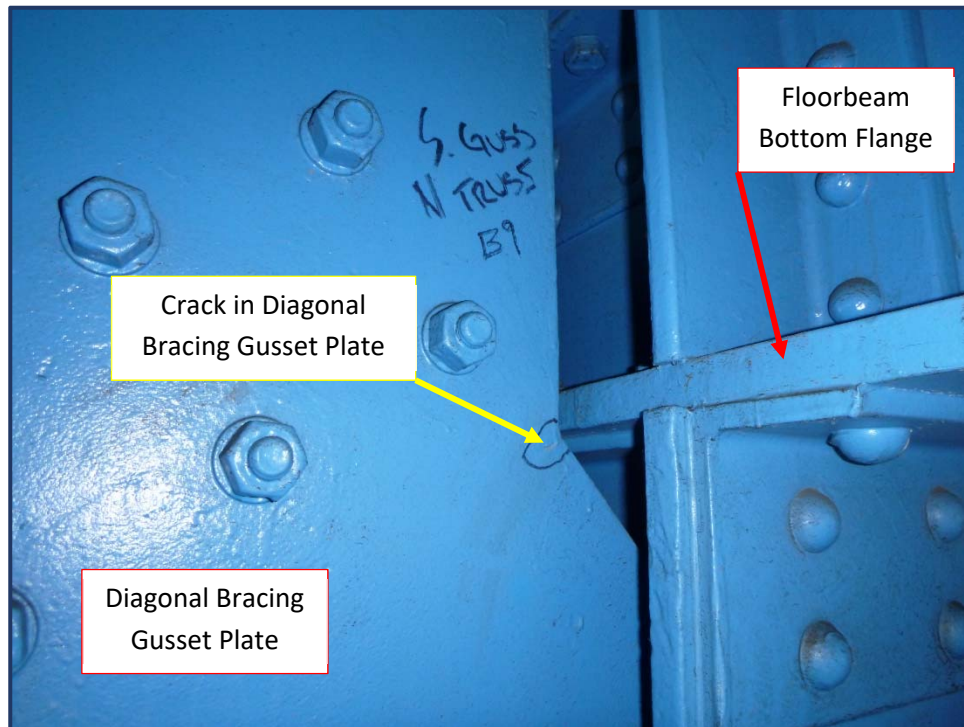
Crack in Diagonal Bracing Gusset Plate, Unit III, Floorbeam 9, North Column
